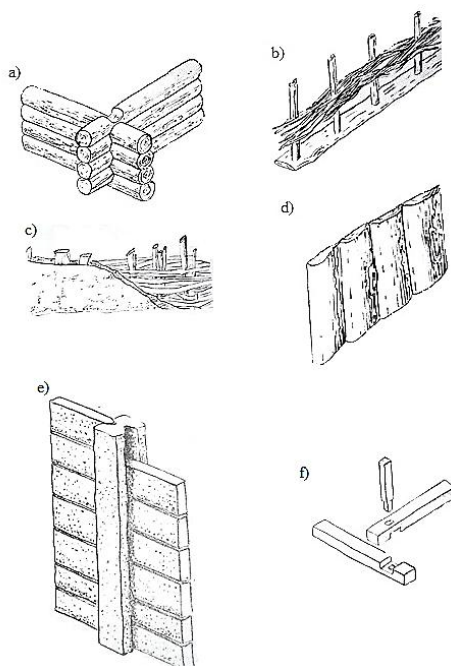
Different kinds of lake-dwelling walls: a)Block-construction; b)Wattle; c)Wattle and daub; d)Split roundwood; e)Plank-pillar; f)Plank-pillar with mortise and tenon joints (Drawings: Olenka Dmytryk) (from Menotti 2012: 135, figure 4.4).
